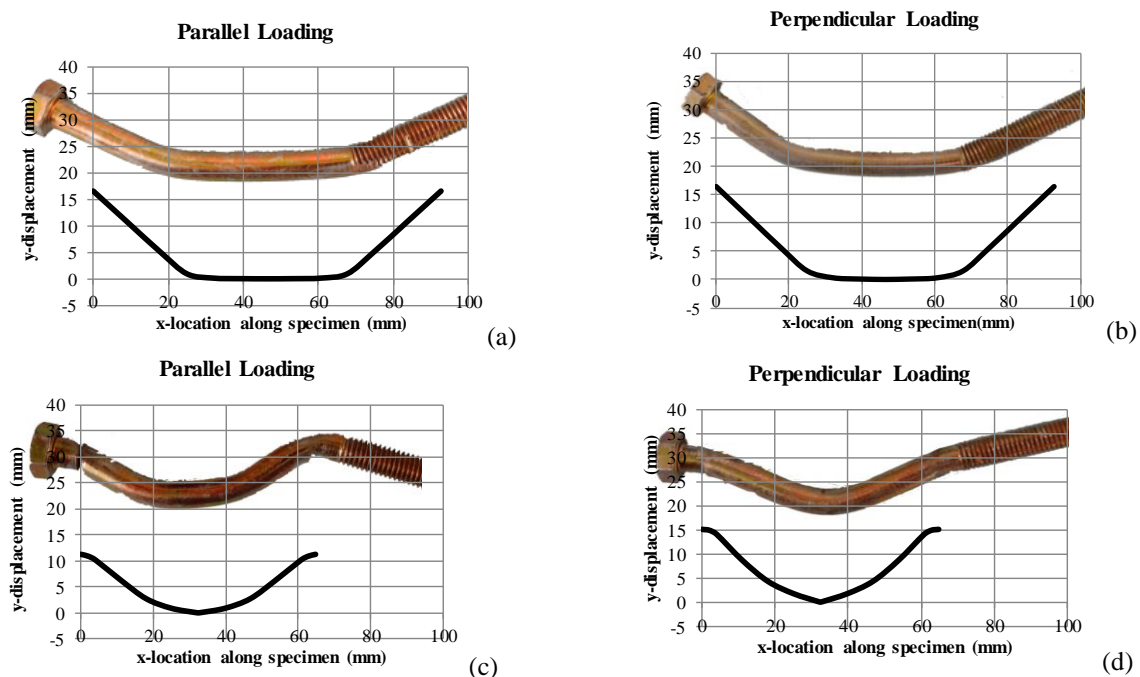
Bending deformation of the bolt and its prediction value given by the DOWEL program: (a)-(b) Composite connection with plywood side plates; (c)-(d) Composite connection with steel side plates
